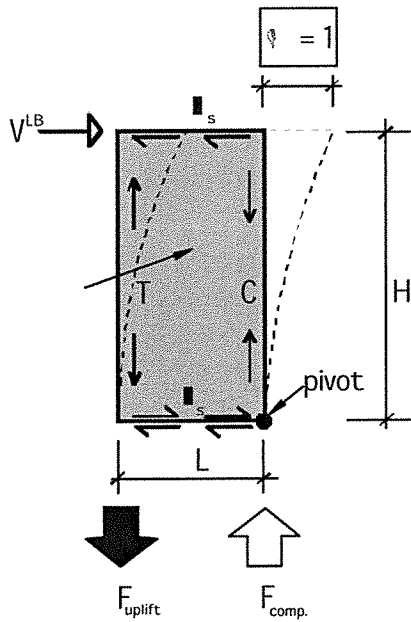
Traditional Approach to Shear Walls with Openings
